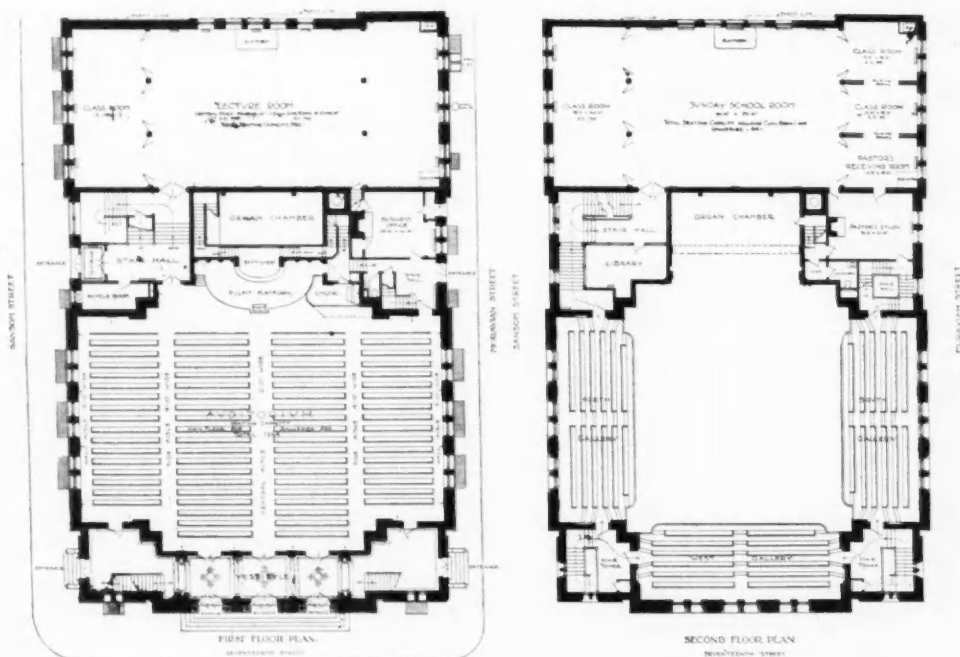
FIRST BAPTIST CHURCH, PHILADELPHIA, PA. GREEK CROSS AUDIENCE HALL PLAN.
